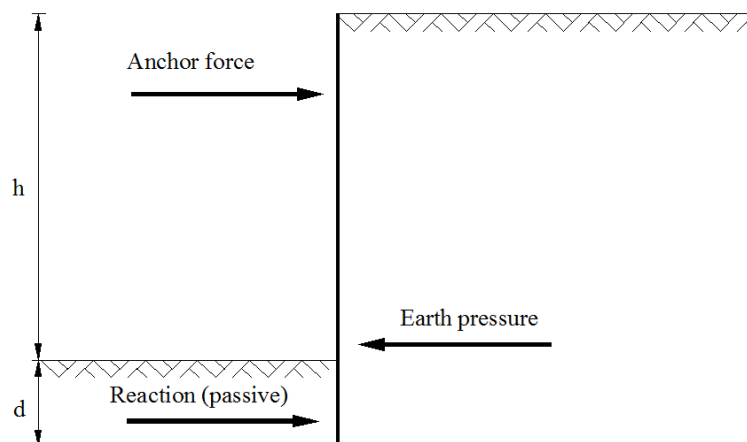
Schematic vision of the net earth pressure in an anchored wall
